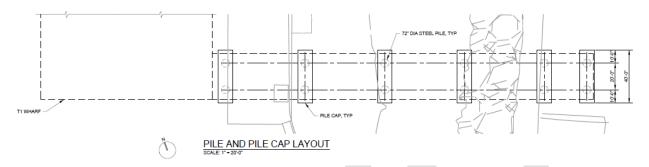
Pile Layout for T1 Access Trestles: Alternative 2A with 72-inch-diameter Driven Piles
